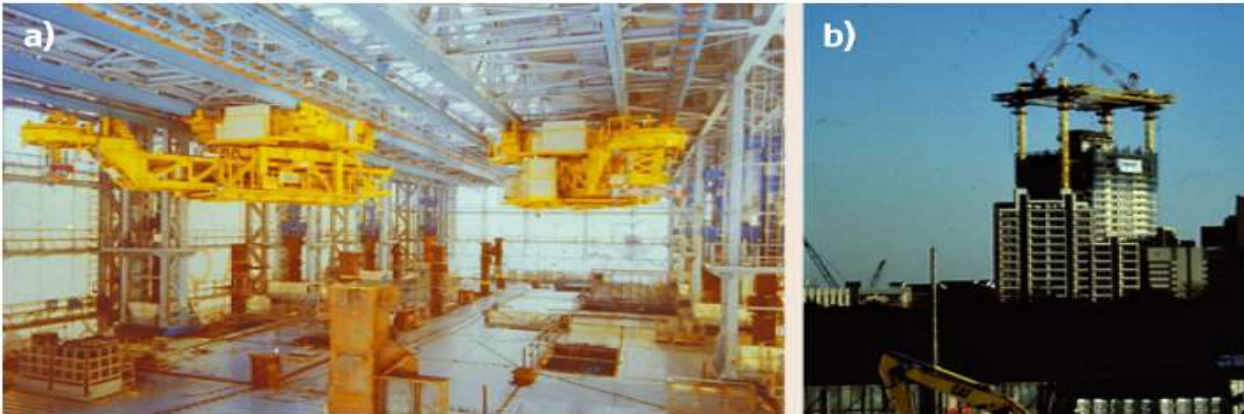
(a) Robotic trolleys for transporting and positioning of beams, columns, floor panels, building services units and facades, in Shimizu SMART system; (b) SMART roof field factory view adopted from (Saidi et al., 2016)
